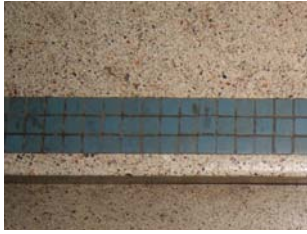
Terrazzo with blue mosaic detail can be found on the ground floor entrance lobby floor
